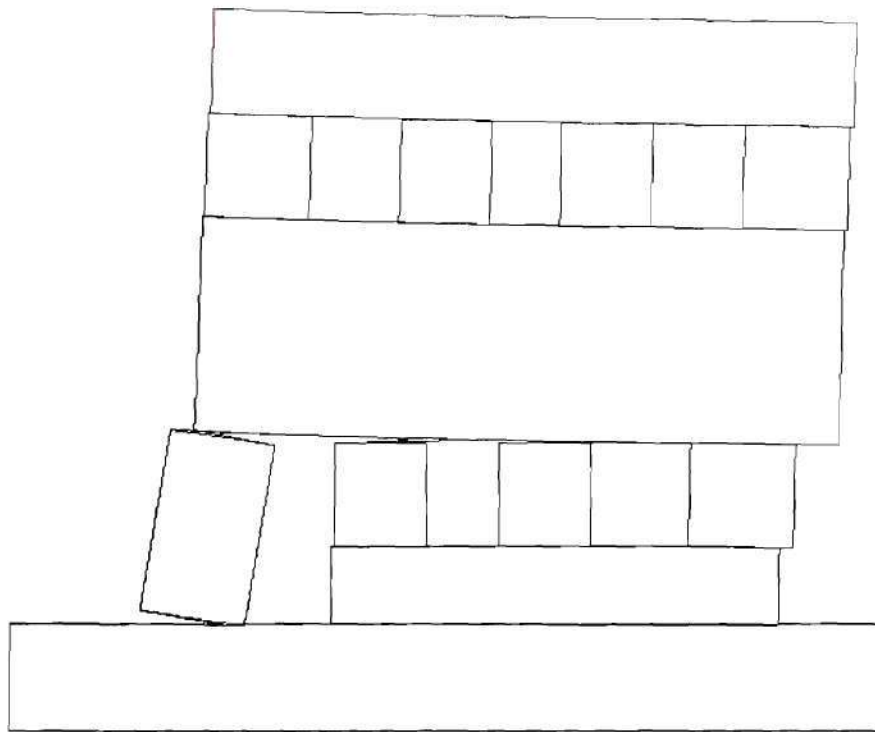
Deformed shape of Wall AB (loaded to the right)
